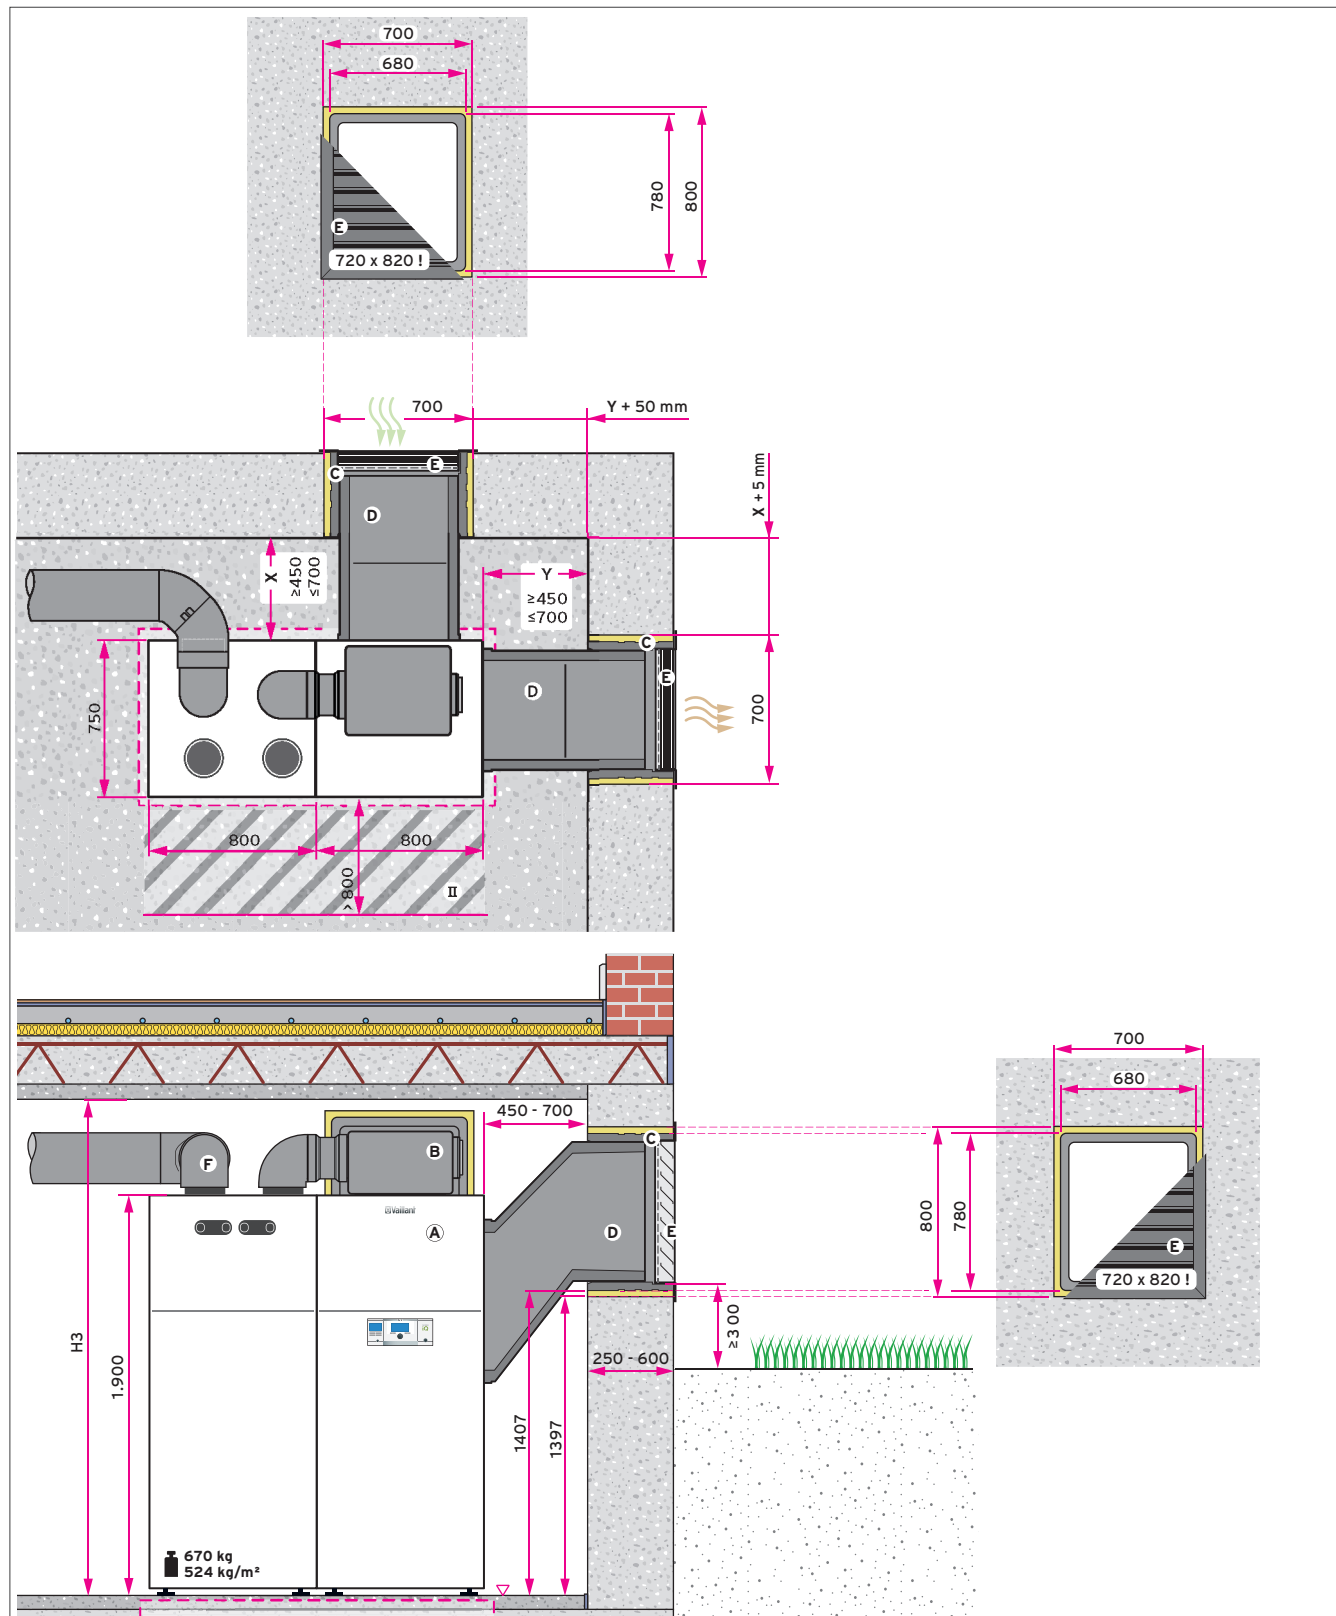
recoCOMPACT installation situation, ground floor - right-hand installation in the corner of a room, air supply via cellar adapter
